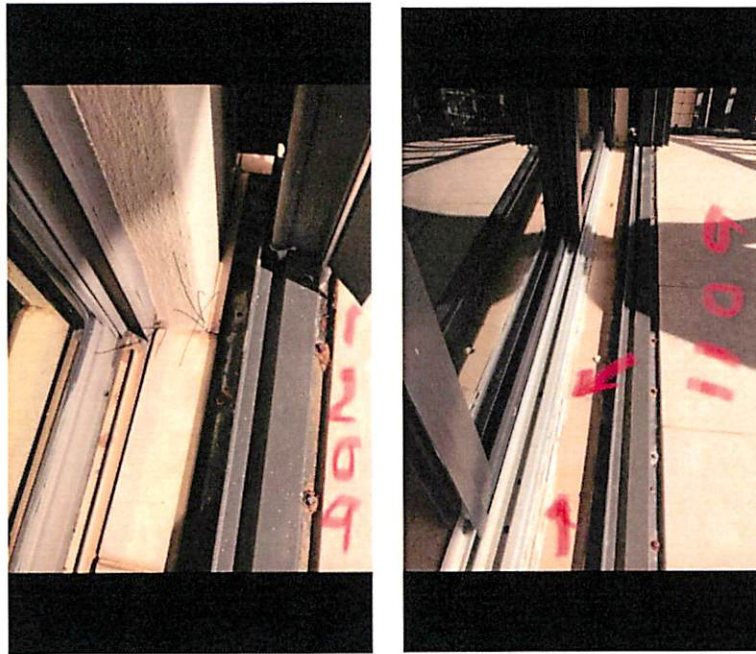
Exterior sealant past its serviceable lifespan at sealant between the window/door frames and masonry/concrete walls & balcony floors
